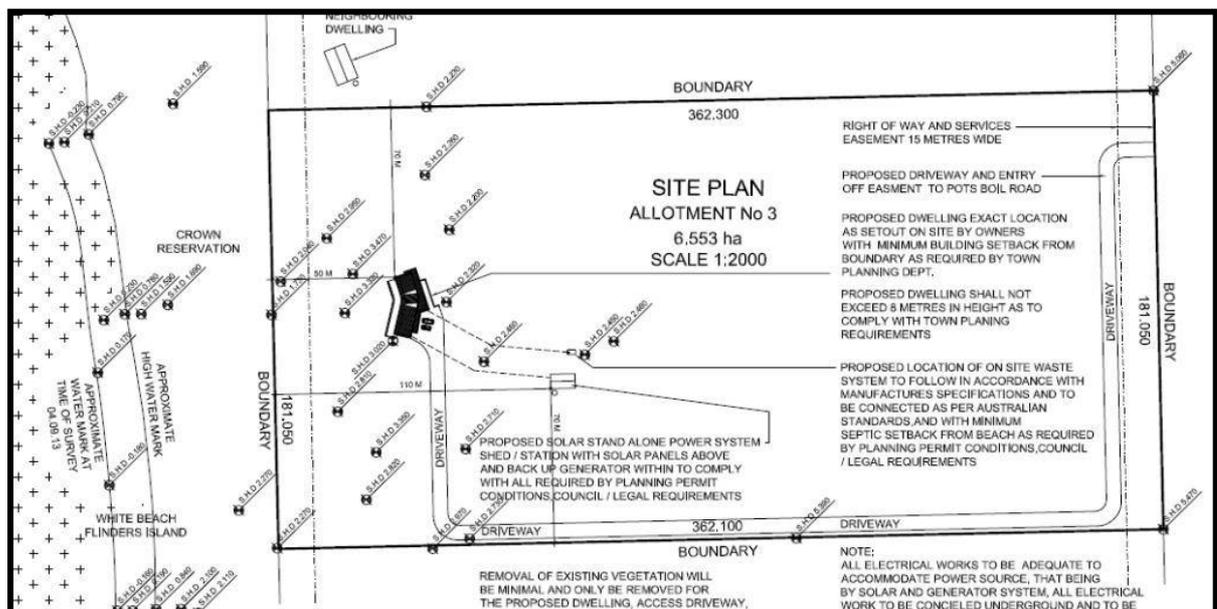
Proposed site plan showing the location of the proposed house and outbuilding.
